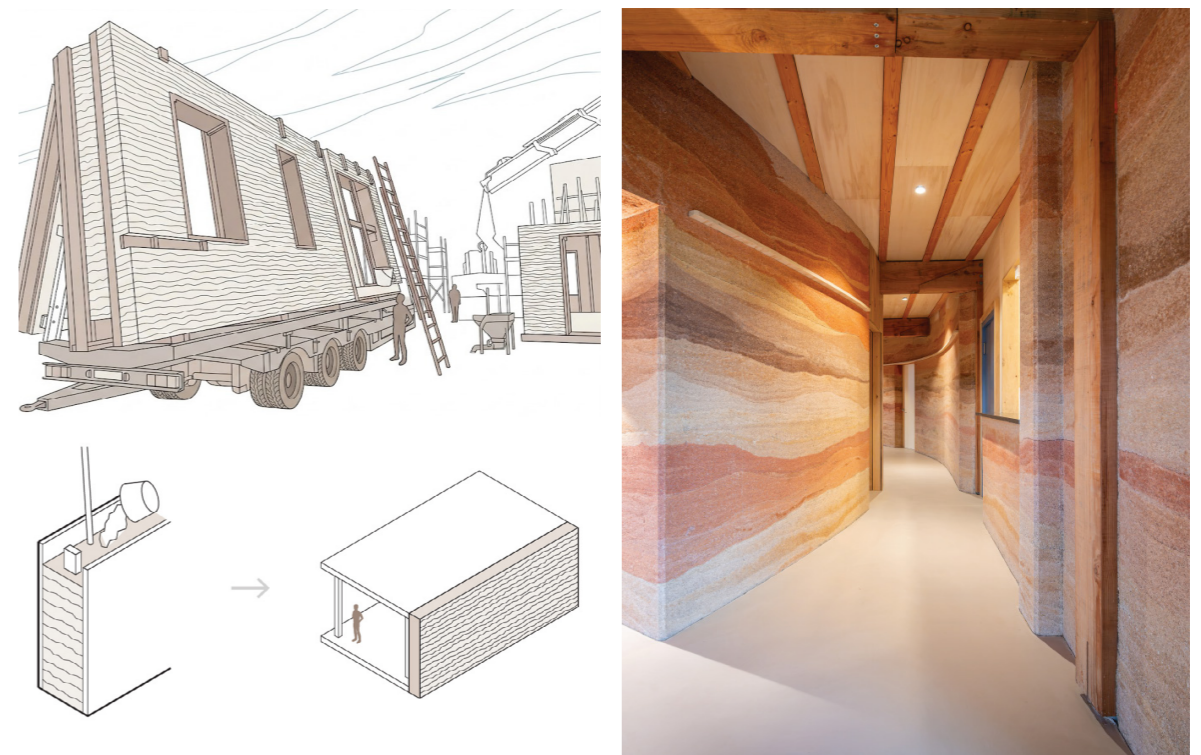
Cast-in situ hempcrete wall. Project by Giesen Architects and YOMABOUW.
